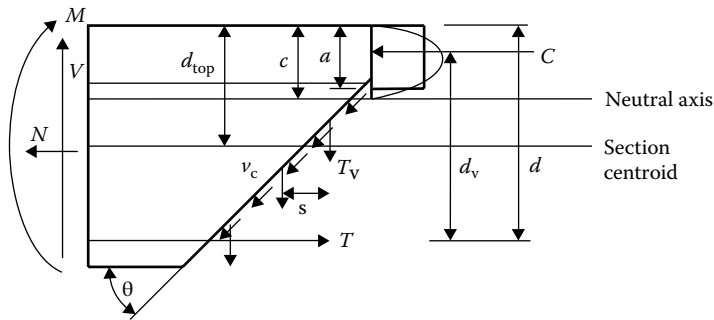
Stresses and forces along a cracked section of concrete.
